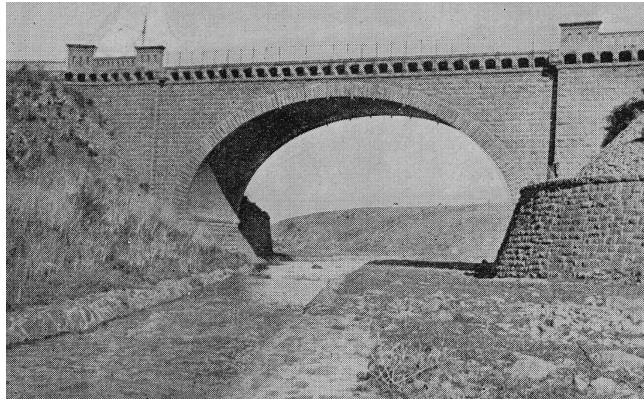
Merri Creek bridge on Heidelberg Rd, c1930
